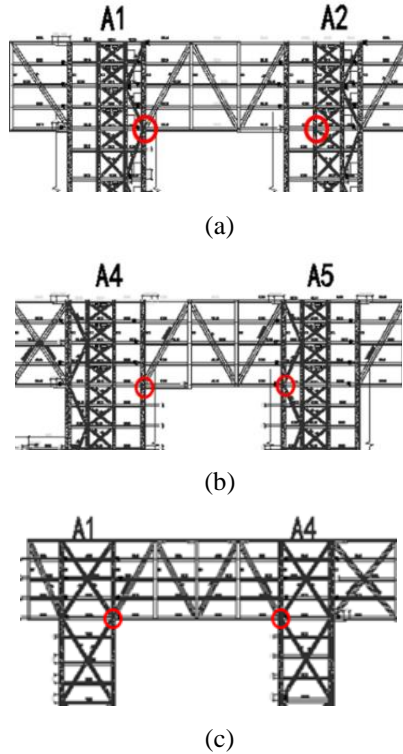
Positions of joints for stiffness updating. (a) truss A1-A2. (b) truss A4-A5. (c) truss A1-A4
